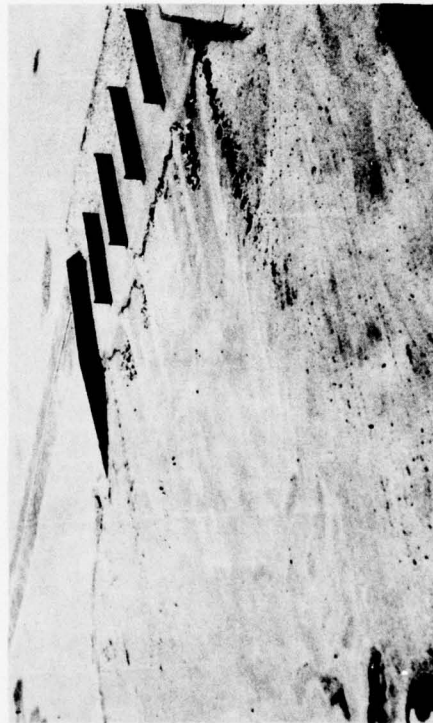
General model Rosemead drop structure, scale 1:60. Scour downstream of bridge after 38-min run (model); discharge 30,000 cfs through bridge and none in Rio Hondo, low tailwater conditions
